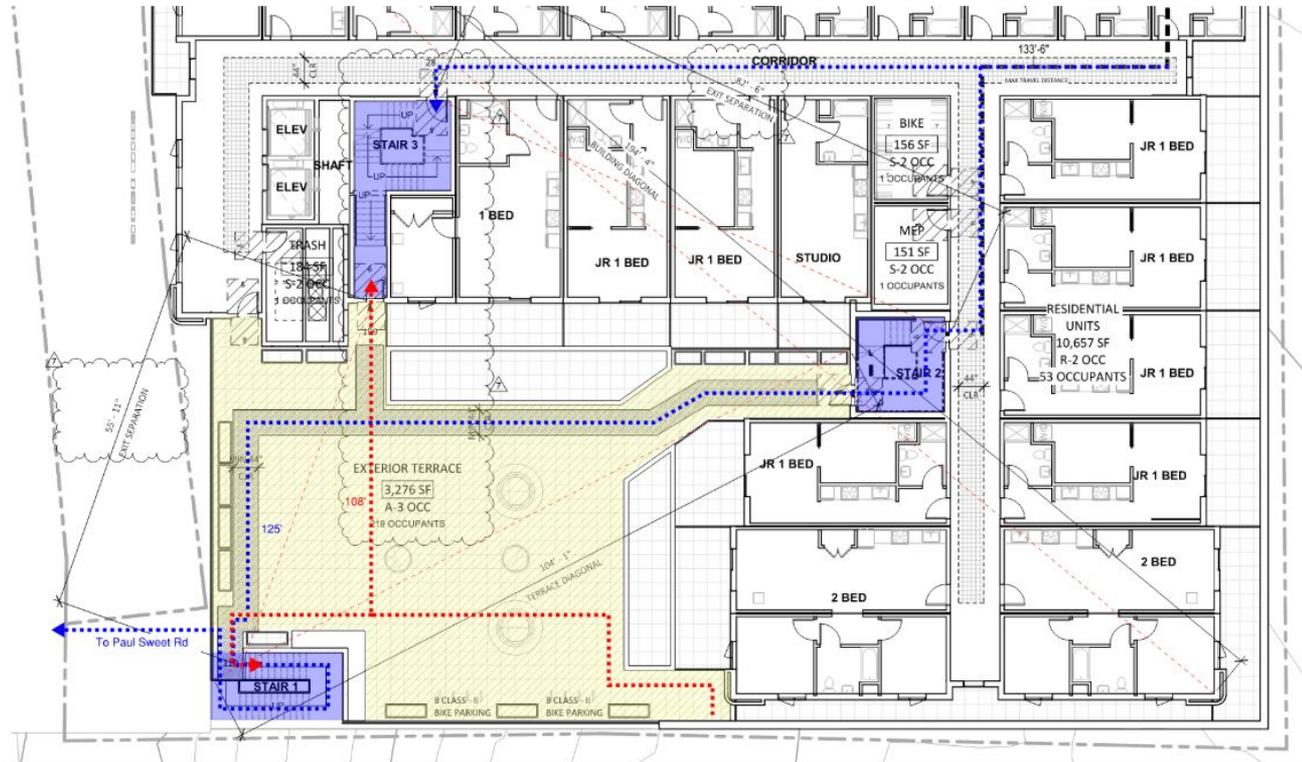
Diagram of exit access from Level 2 depicting egress from building corridor (blue dashes) and exterior terrace (red dashes); the entire terrace (yellow hatch) is open to sky.
